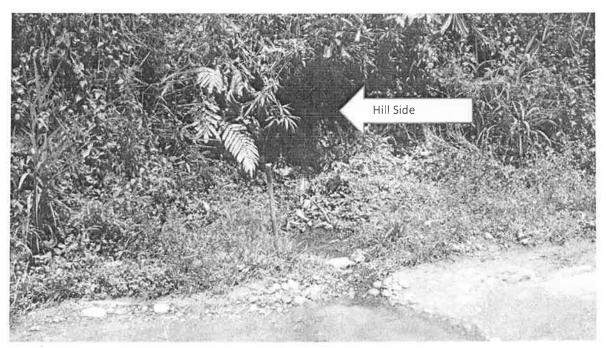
View (@ km 75+260) of Stream Crossing Project Road Alignment
